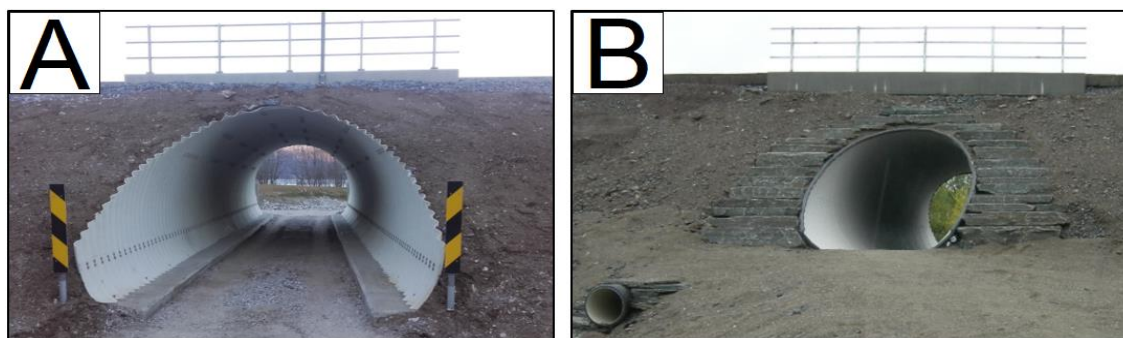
Two typical profiles used in Norway, showing A) Sjånes and B) Solheim culvert (FOTO: ViaCon Norway As)
